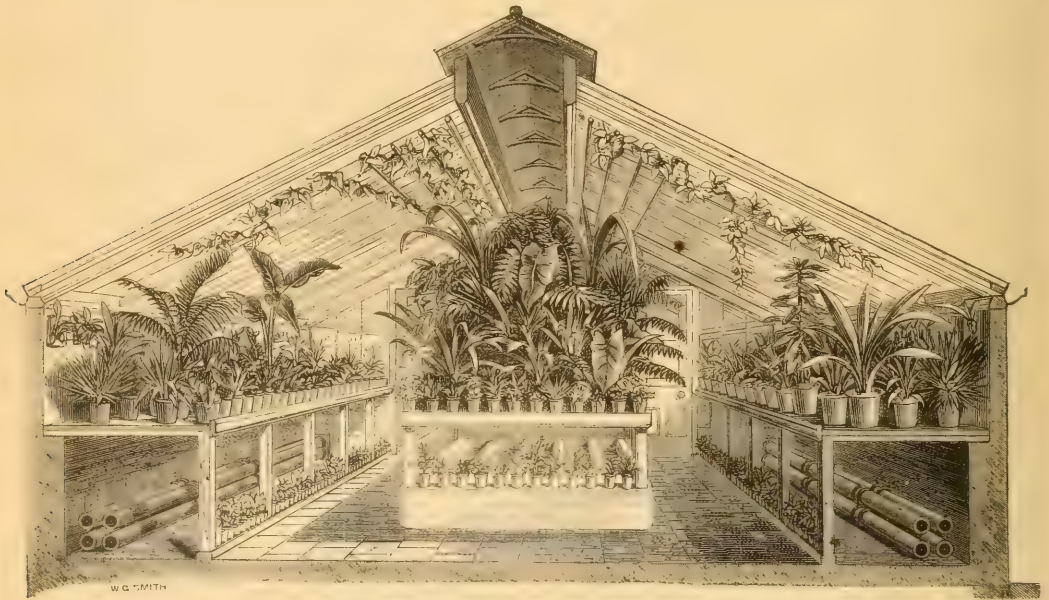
MR. BULL'S HOUSE FOR NEW PLANTS.
